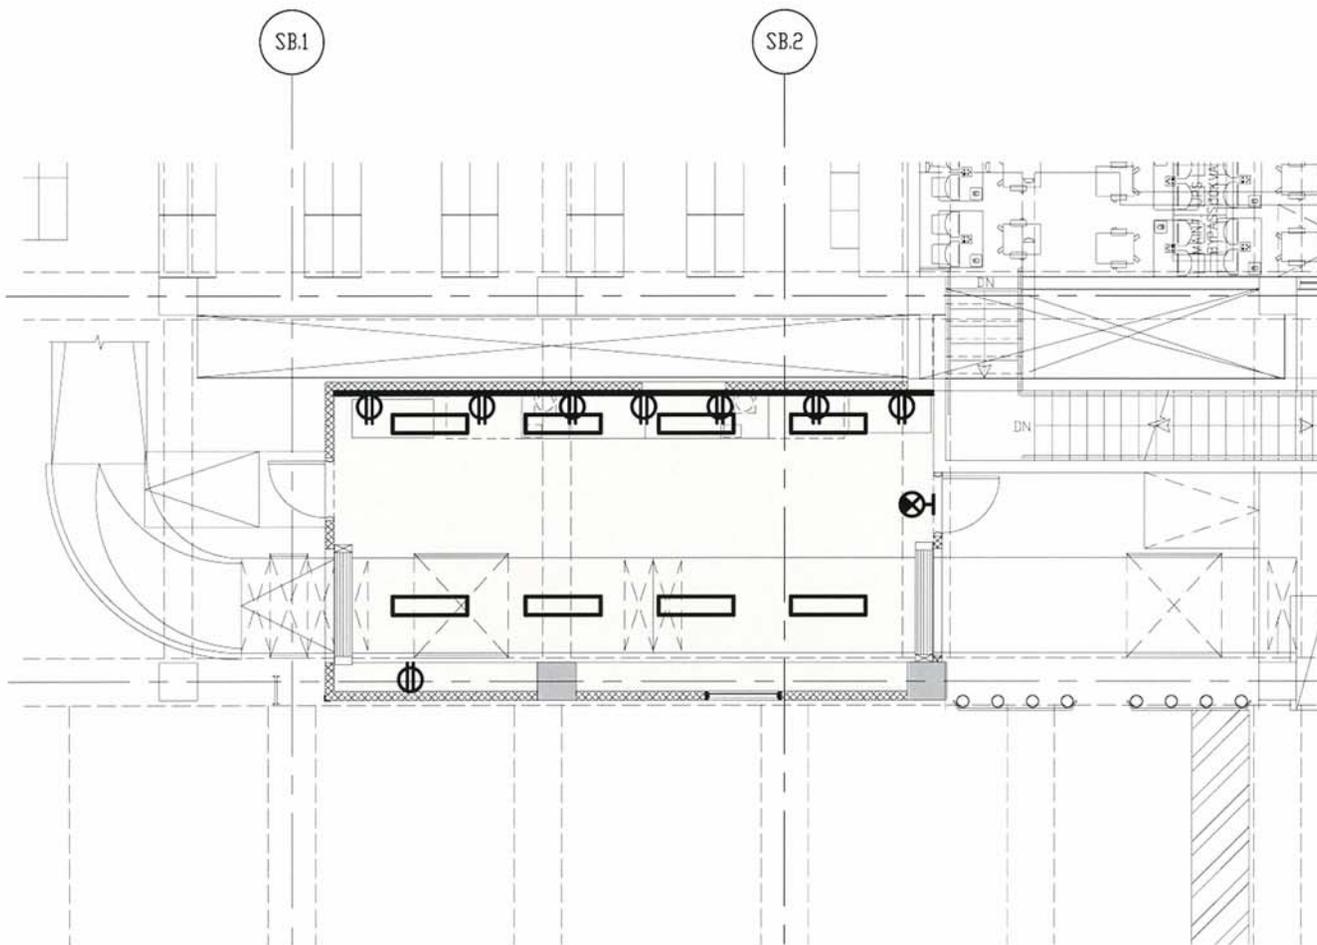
Electrical & Special Design Systems for New Baggage room
